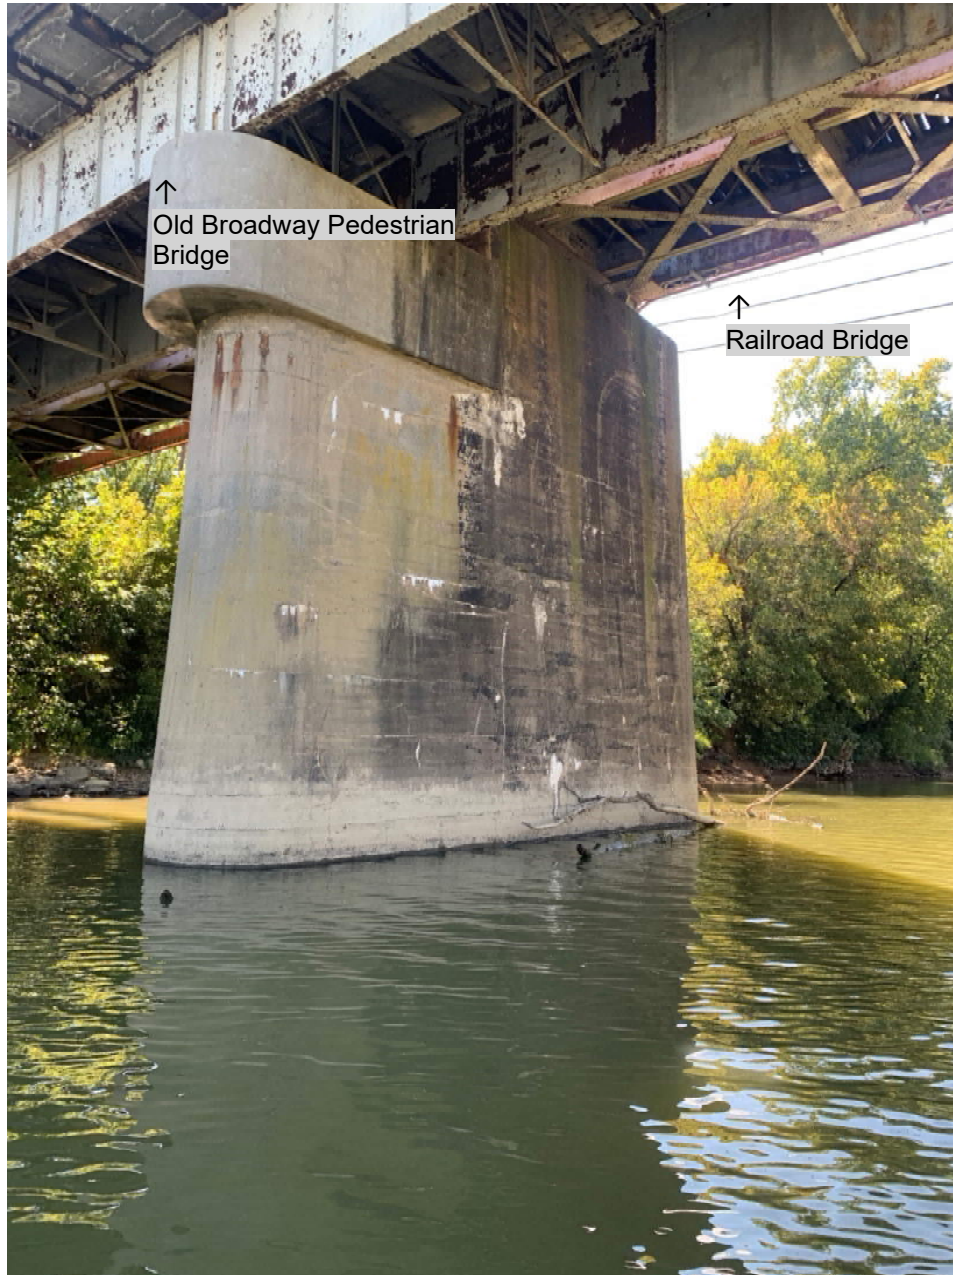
Pier 4 Looking East (Shared Pier with Railroad)
